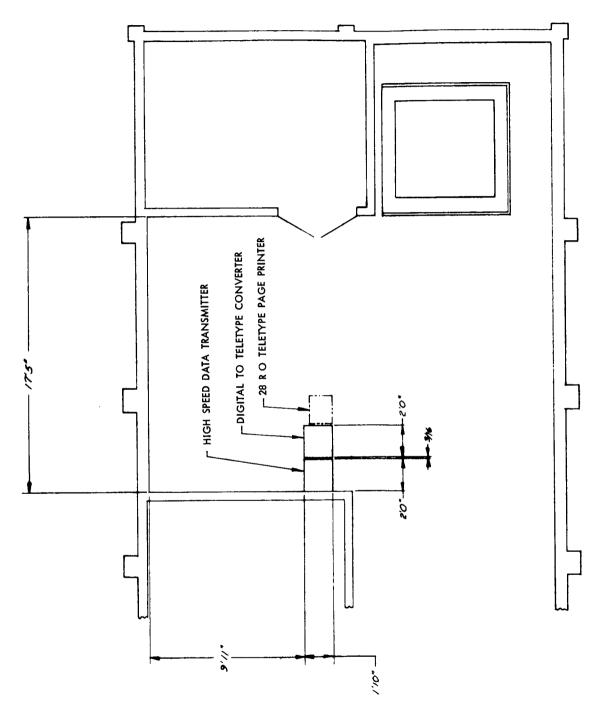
Wallops Island FPS-16 Radar Building - Layout Diagram
